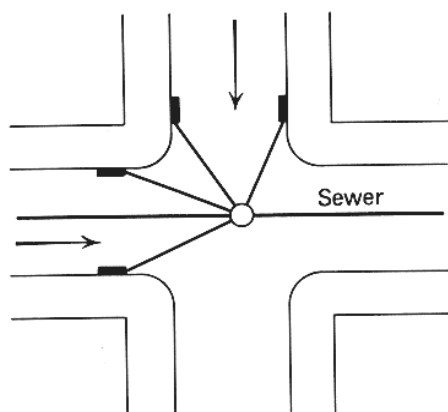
Street intersection showing inlets and branch lines from inlets to main sewer. Arrows show direction of surface flow.
